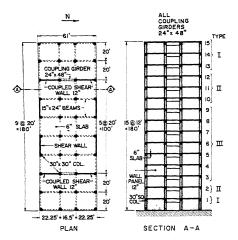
STRUCTURAL LAYOUT OF 15-STORY R/C FRAME-COUPLED WALL BUILDING
